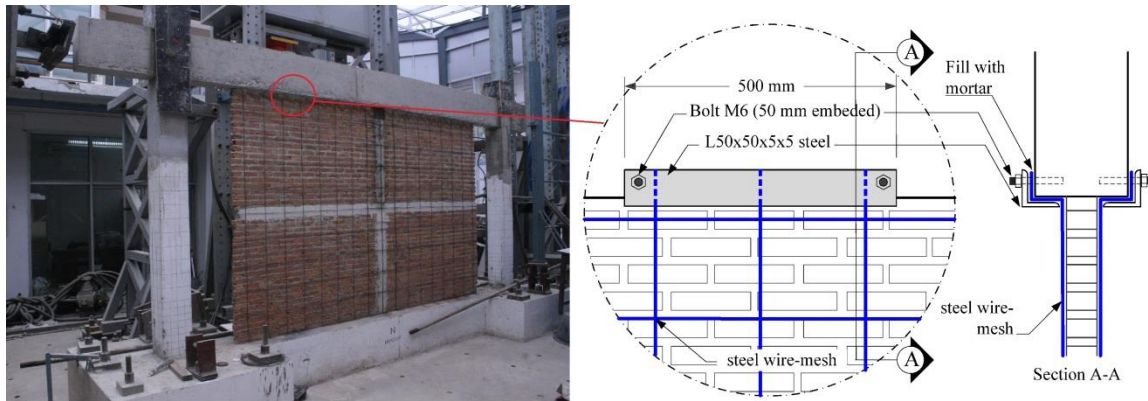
URM of test specimen SP80 reinforced with steel wire mesh
